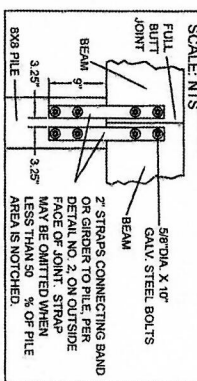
TYPICAL PORCH POST CONNECTION
